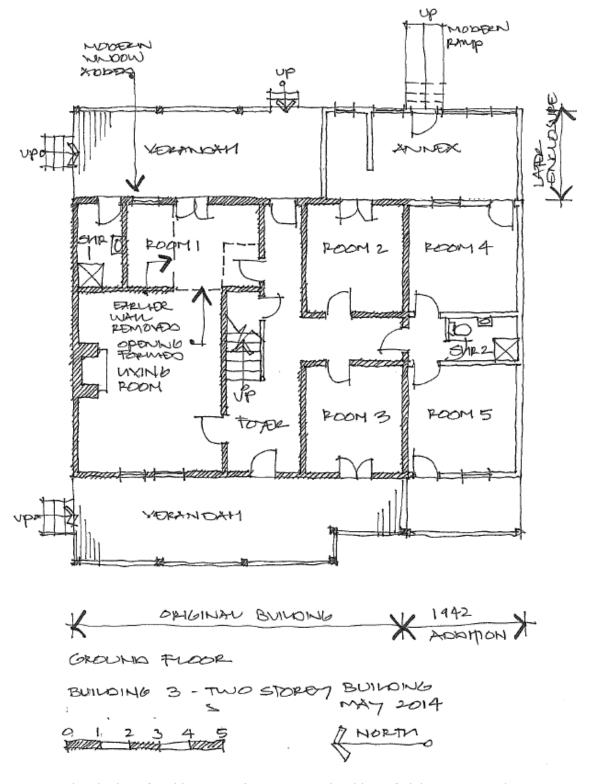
Sketch plan of Building CM3. (Source: David Hobbes of Philip Leeson Architects, May 2014)
